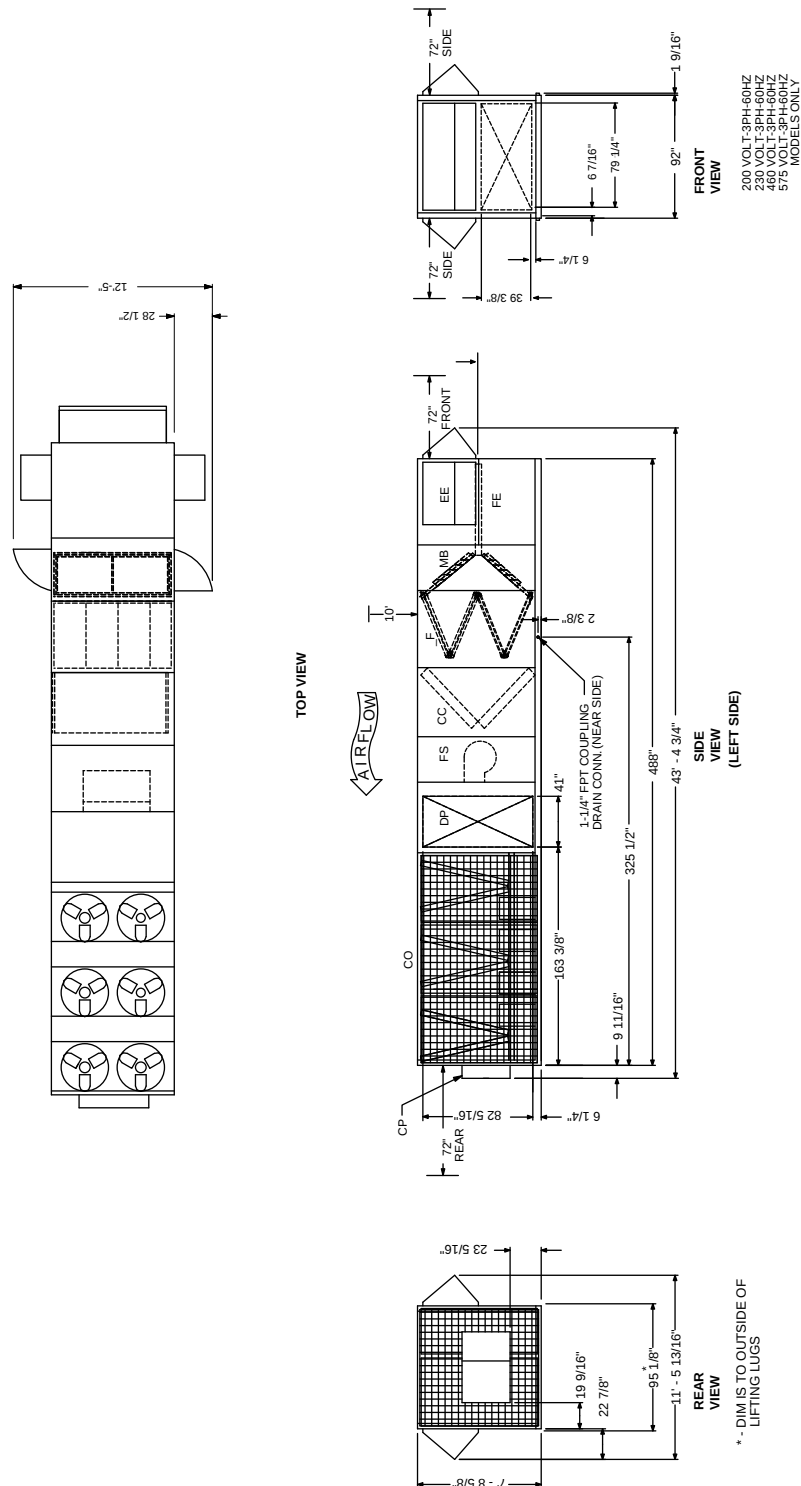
GENERAL ARRANGEMENT DRAWING
